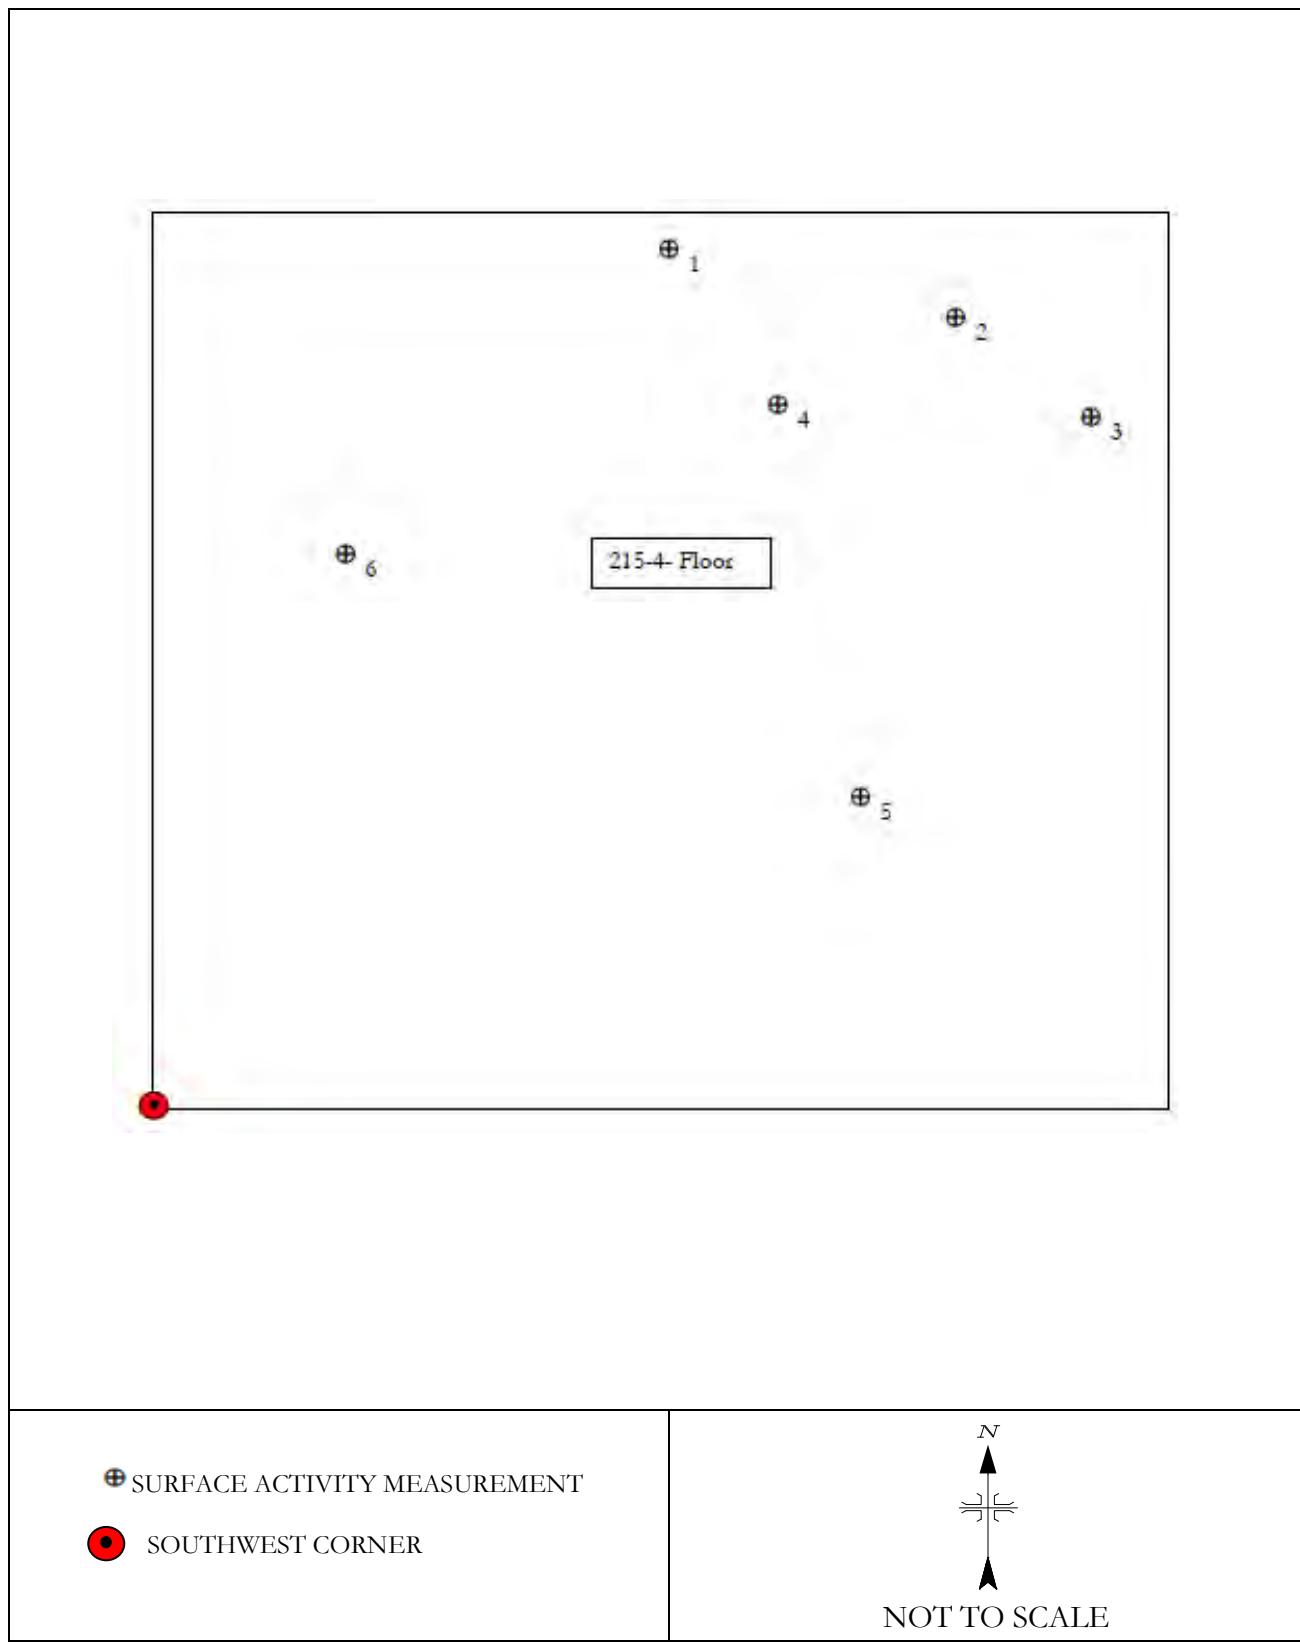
Building 215 Section 4—Direct Measurement Locations
